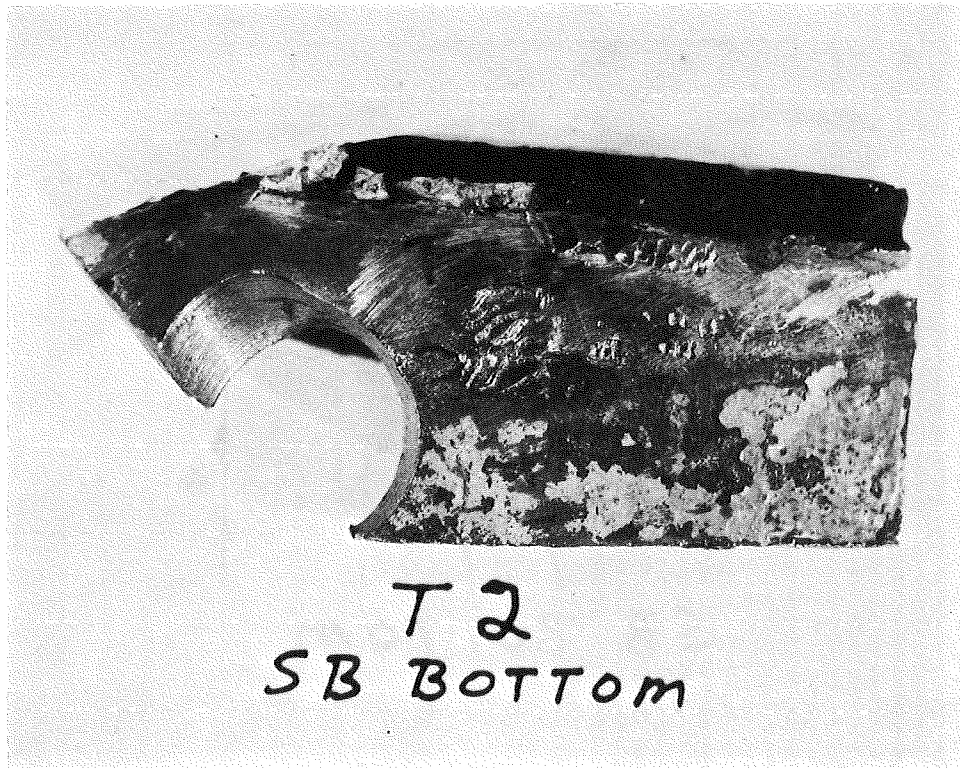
Sample Removed at Panel Point T2-SB Bottom
